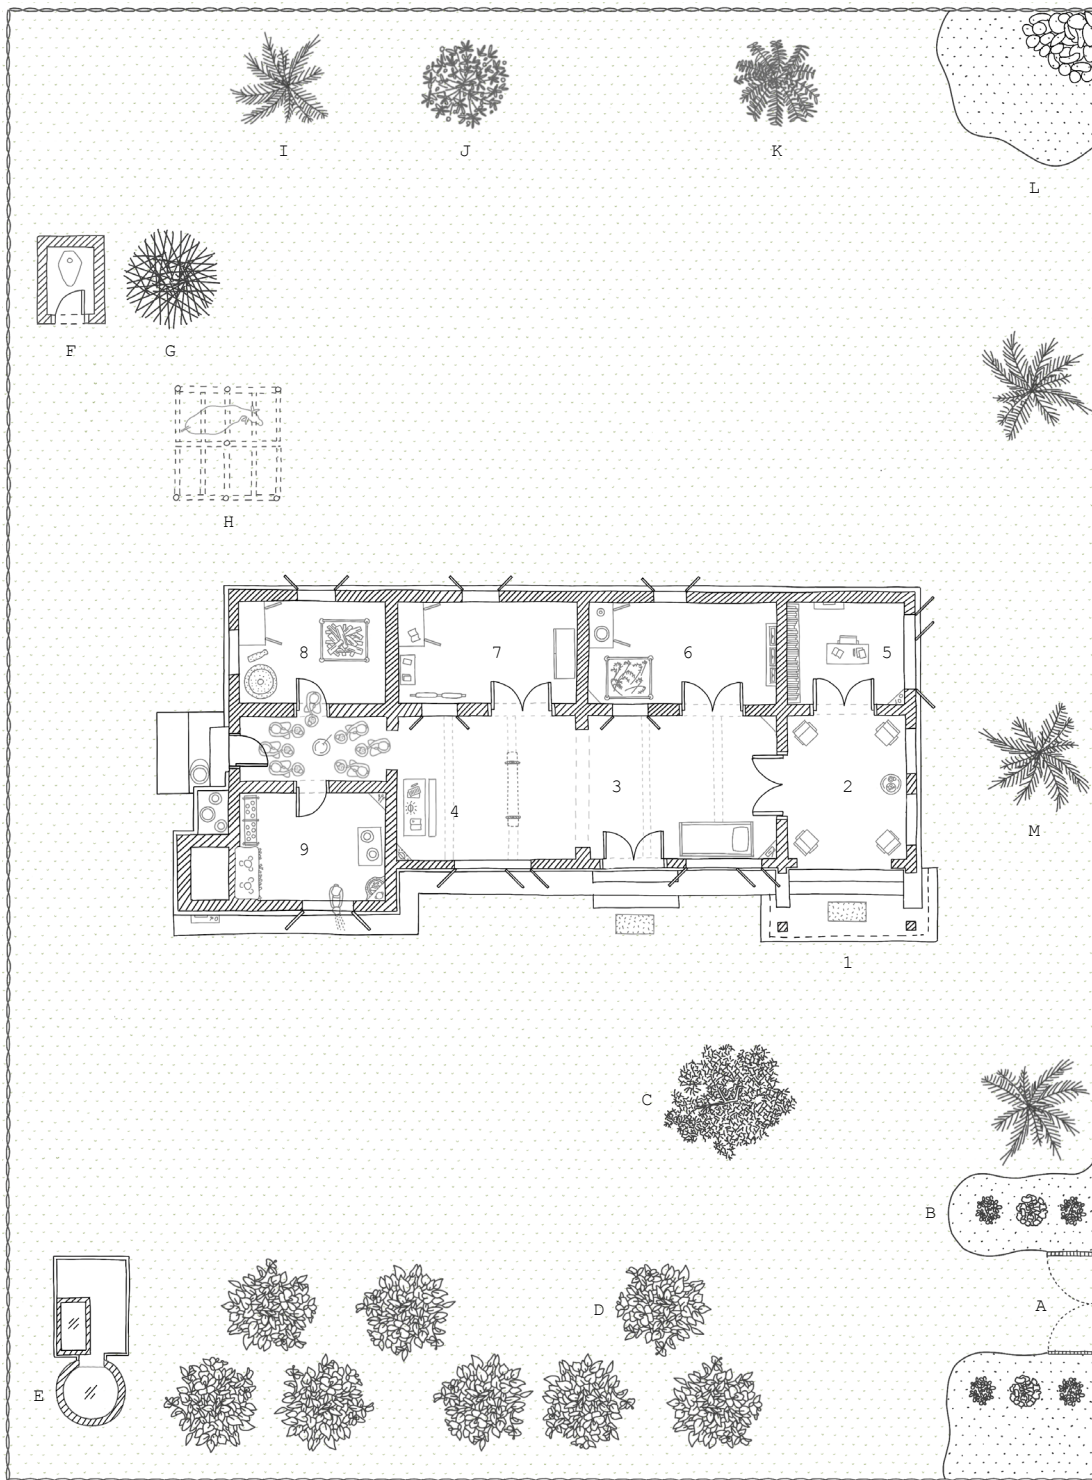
Site plan sketch of Appa's childhood house in Jaffna.
